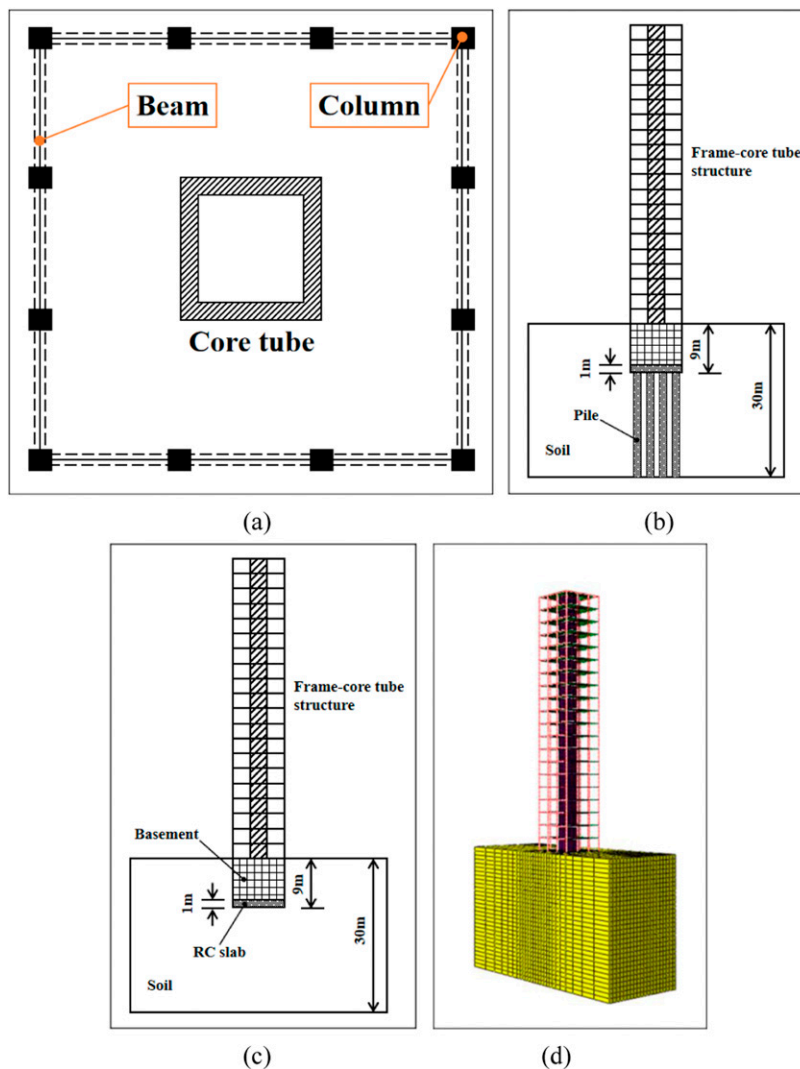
The setup of the frame-core tube structure: (a) plan view of the standard storey (b) end bearing piled foundation-supported structure (c) classical compensated foundation-supported structure (d) the finite-element model.
